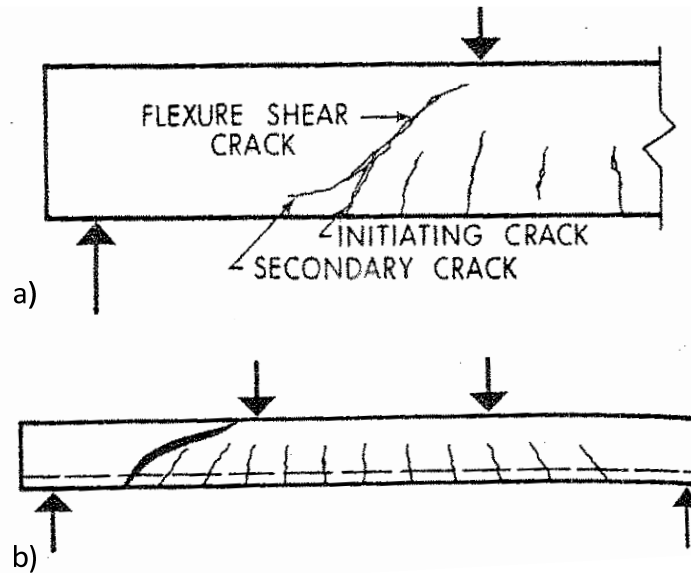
Modes of failure in slender beams (ASCE- ACI 426 (1973))
